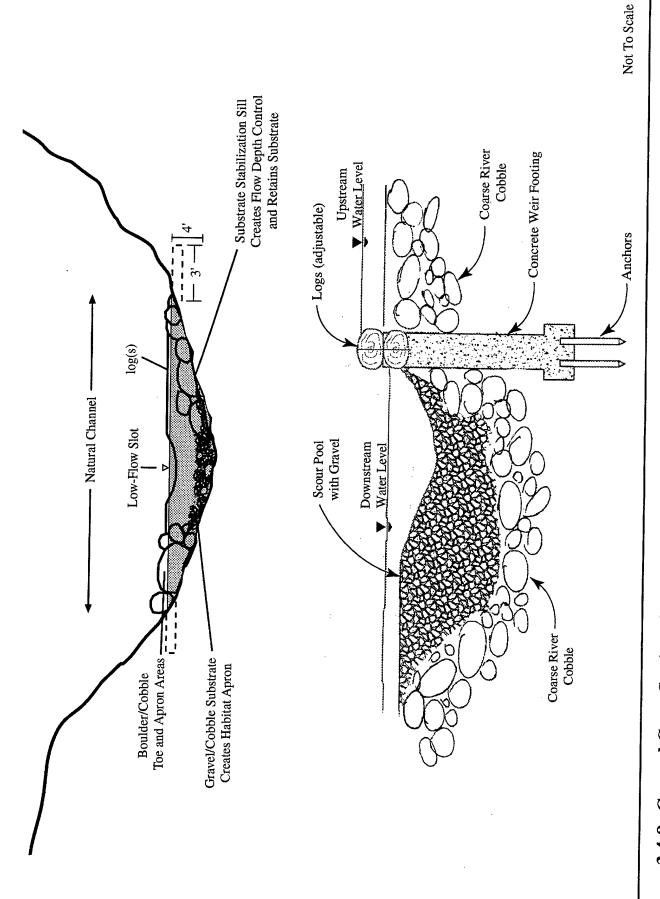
General Cross Section of the Natural Channel in Segments 3A and 3B and the Preliminary Invert Stabilization Structure Design
